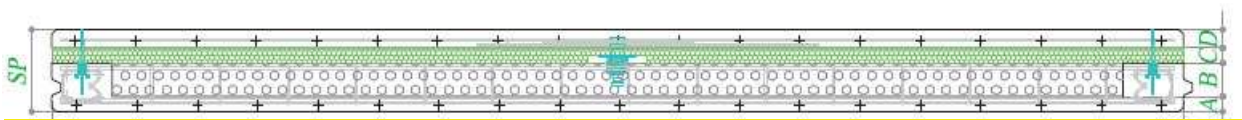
Typical transversal section of a precast vertical panel in one-storey precast structures
